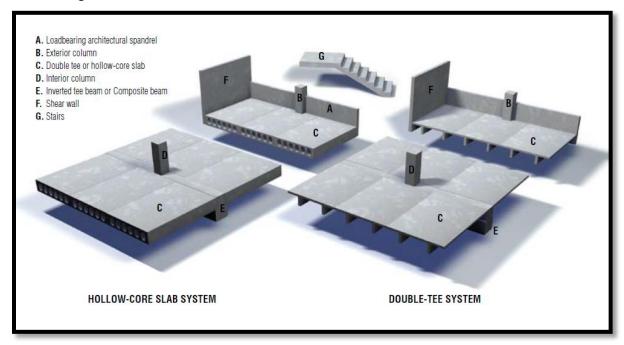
Common Component Systems in Prestressed Concrete Design (Foster et. al., 1997)
